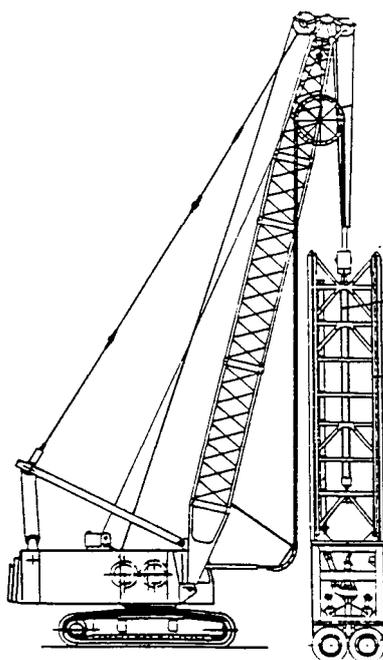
Crawler type excavator with wall cutter equipment (diaphragm wall grab)
